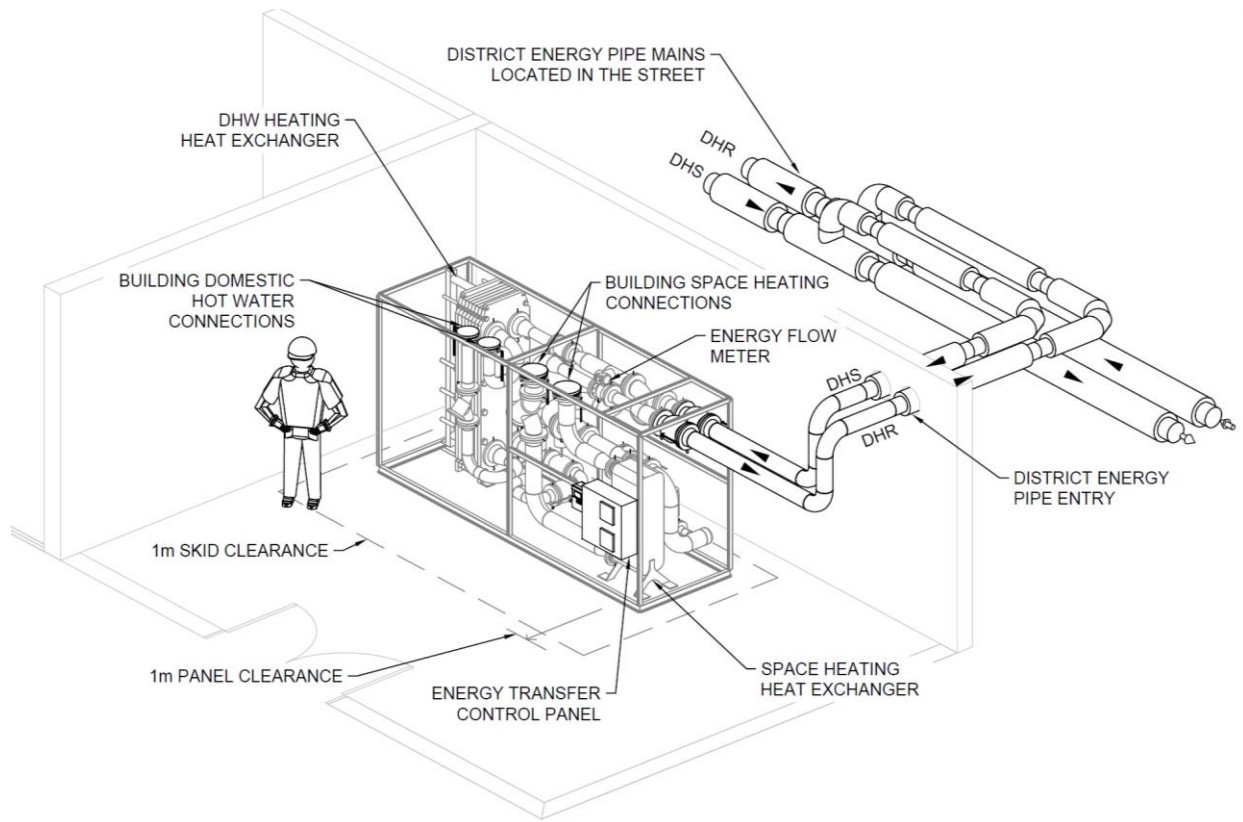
TYPICAL HEATING ETS INSTALLATION IN BUILDING BASEMENT
